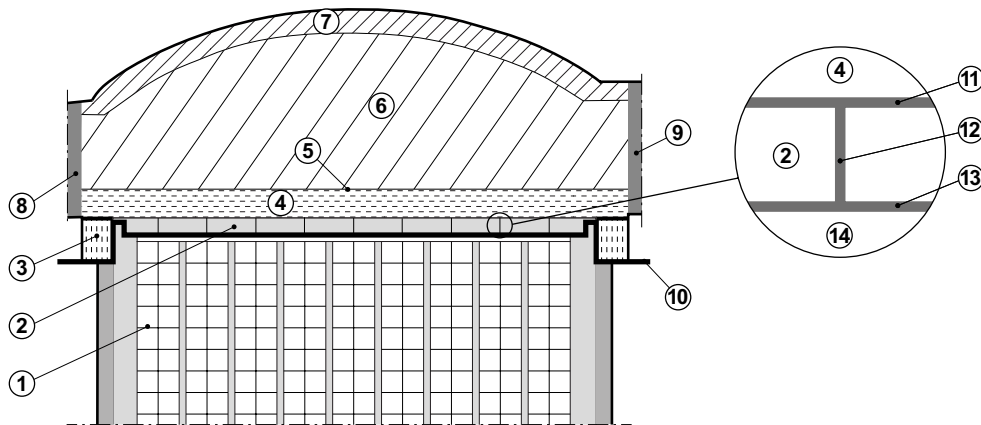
Schematic cross-section of silo top at closure. Key to numbering: 1) Waste 2) Reinforced concrete slab with sand layer and gas evacuation channels 3) Compacted fill with a mixture of 30 % bentonite and 70 % sand 4) Compacted fill with a mixture of 10 % bentonite and 90 % sand 5) Unreinforced concrete slab 6) Compacted fill of friction material 7) Cement-stabilised sand 8) Constraining wall of concrete against silo roof tunnel (1STT) 9) Constraining wall of concrete against loading-in building (IB) 10) Boundary between works associated with grouting and backfilling 11) Sand layer 100 mm 12) Gas evacuation channel Ø 0.1 m 13) Sand layer 50 mm 14) Grout (permeable).
